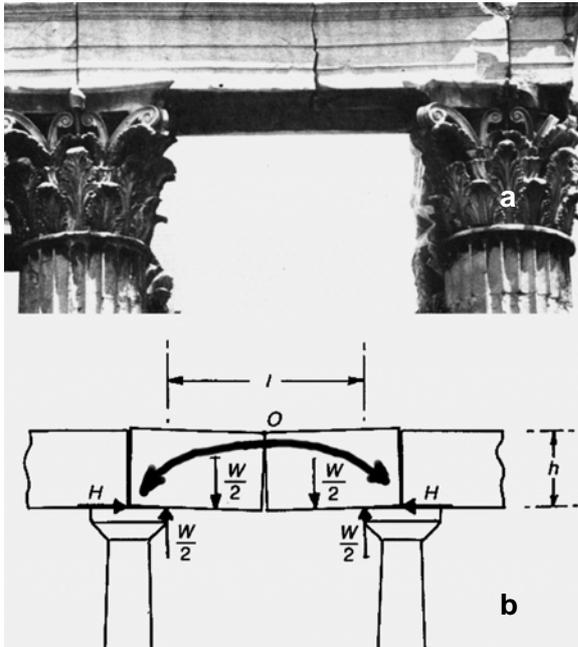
(a): Cracked architrave, temple of Zeus, Athens. (Mainstone)
